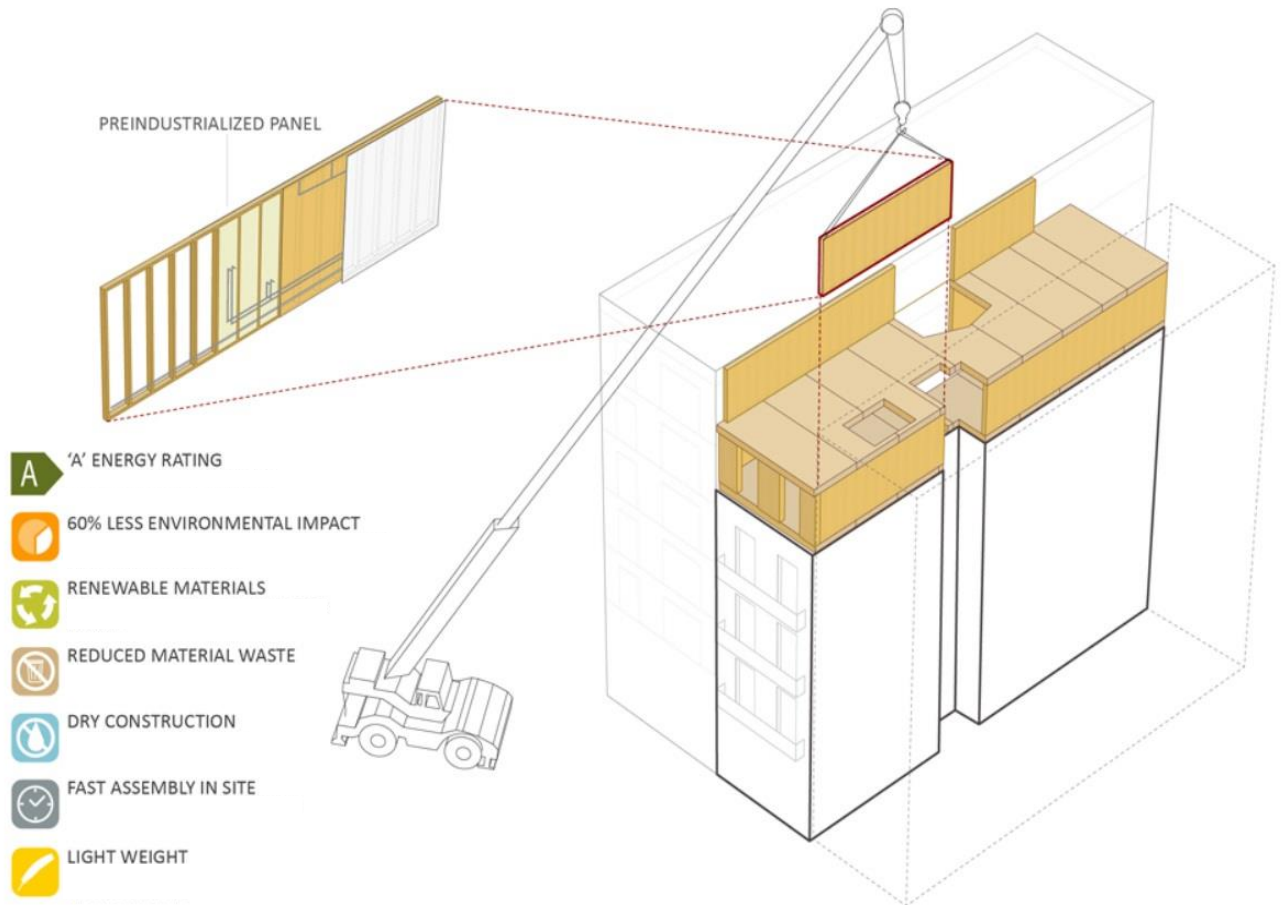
Diagram of construction system. Installation of the prefabricated mass wooden panels. Source: (Miba Architects Website, 2016)
